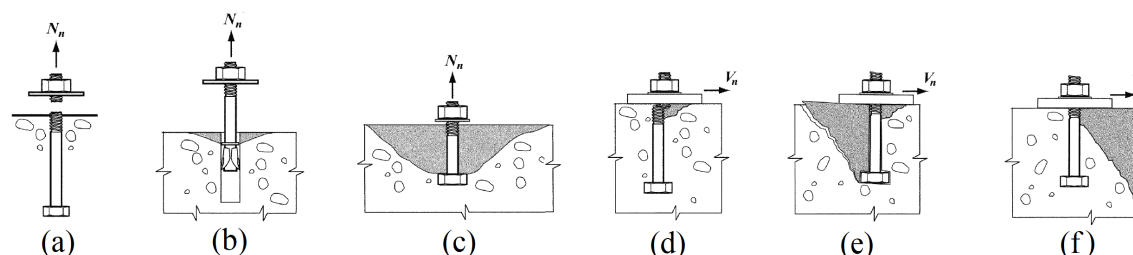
Anchor failure modes: (a) tensile rupture, (b) pull out in tension, (c) bond failure, (d) shear failure, (e) pry out failure, and (f) concrete breakout (ACI 349-13 2013)
